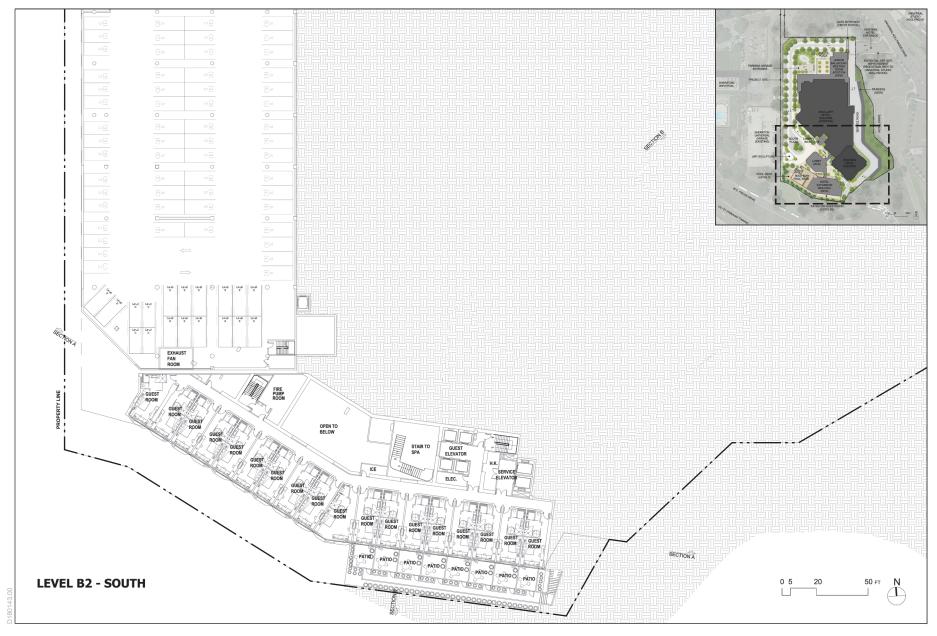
Level B2 (South) – Hotel Expansion Building
